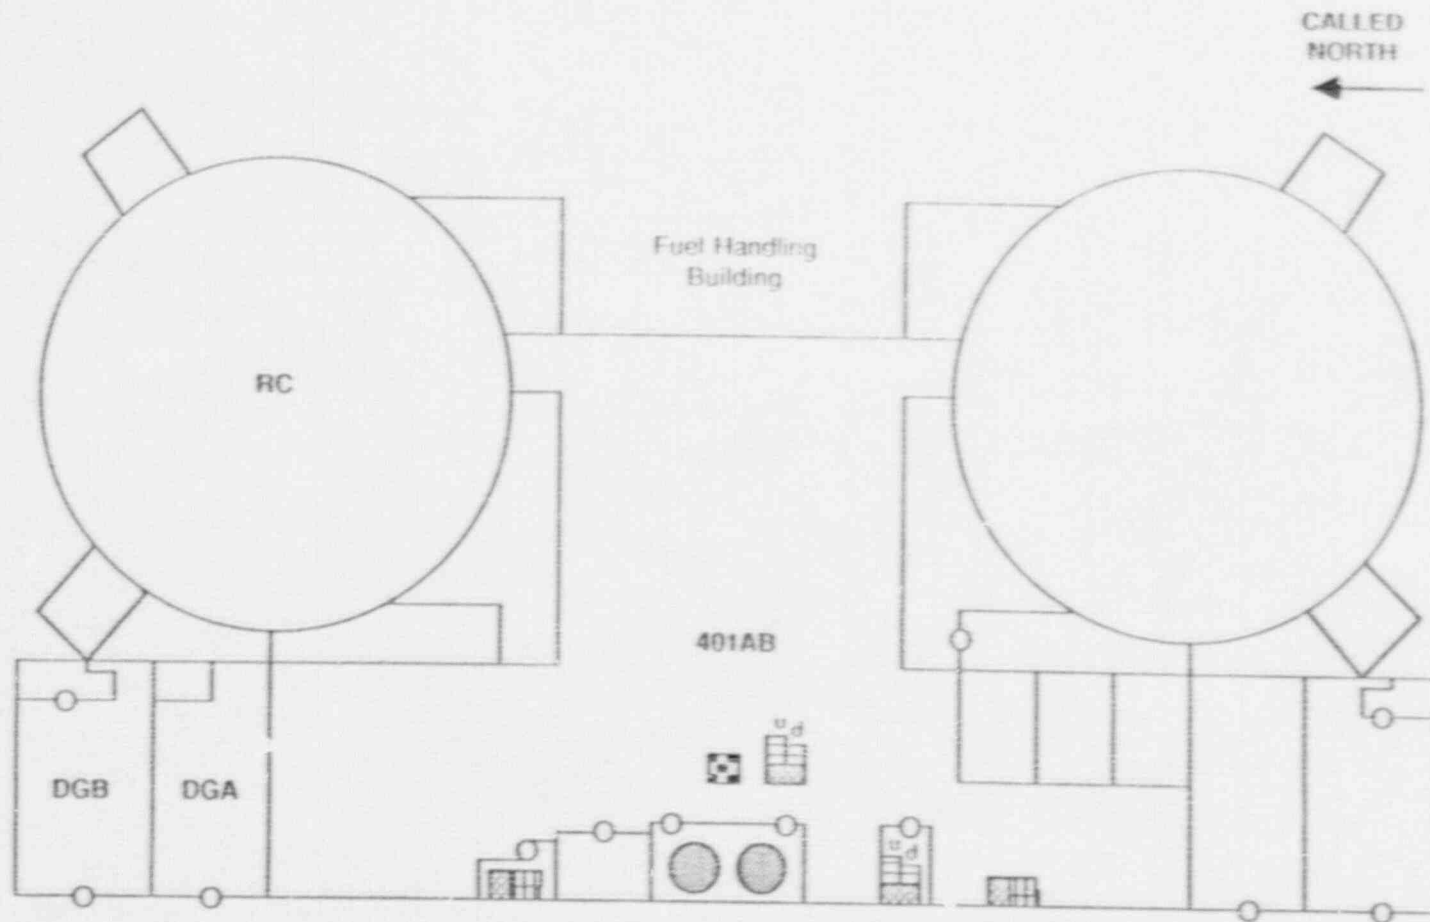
Braidwood 1 & 2 Station Arrangement, Elevation 383'
